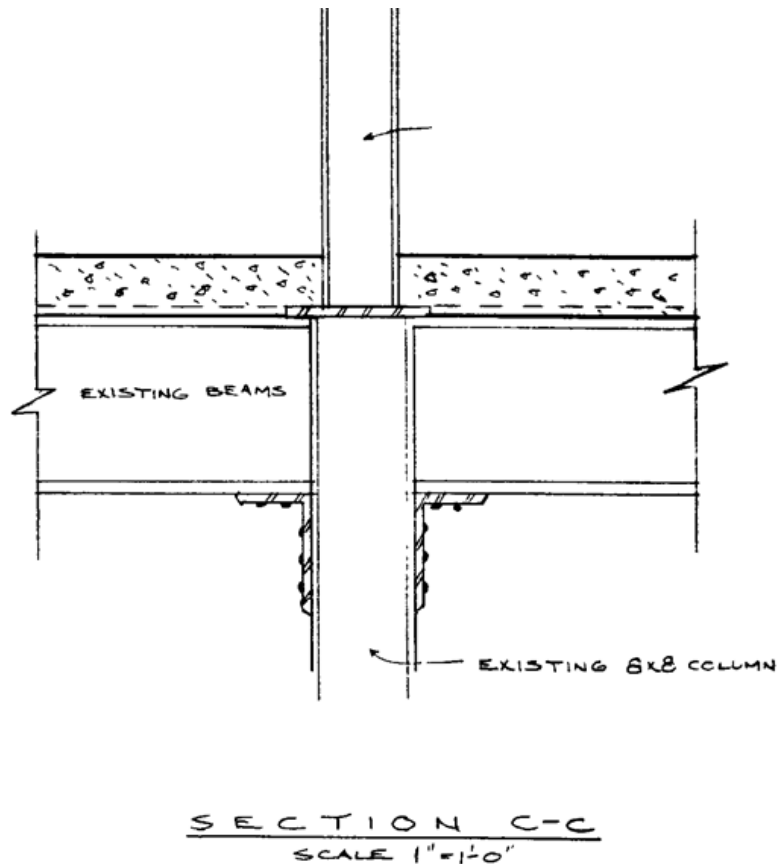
Assumed typical beam-column connection in Model 5. The top flange is disconnected from the column
